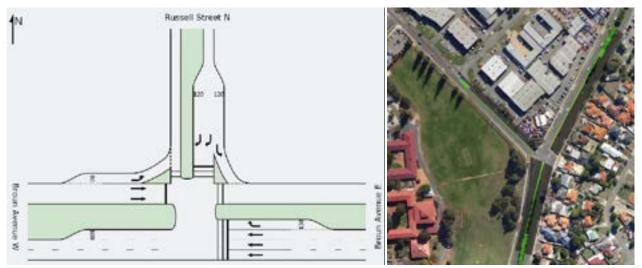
Broun Avenue/Russell Street – Mitigated Geometry
